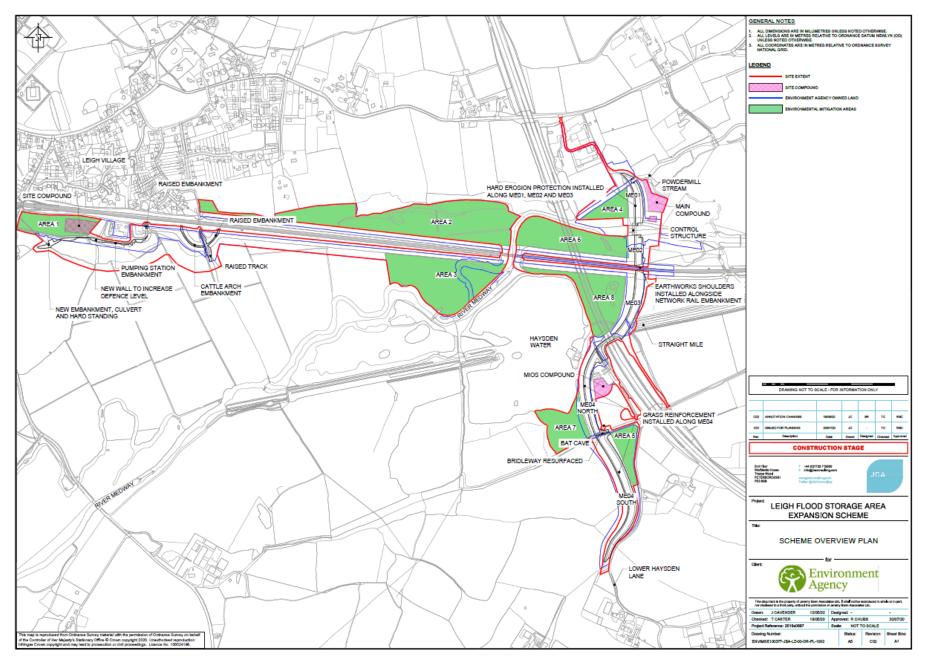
Leigh Flood Storage Area Expansion Scheme Overview Plan – mitigation/enhancement opportunity areas shaded
